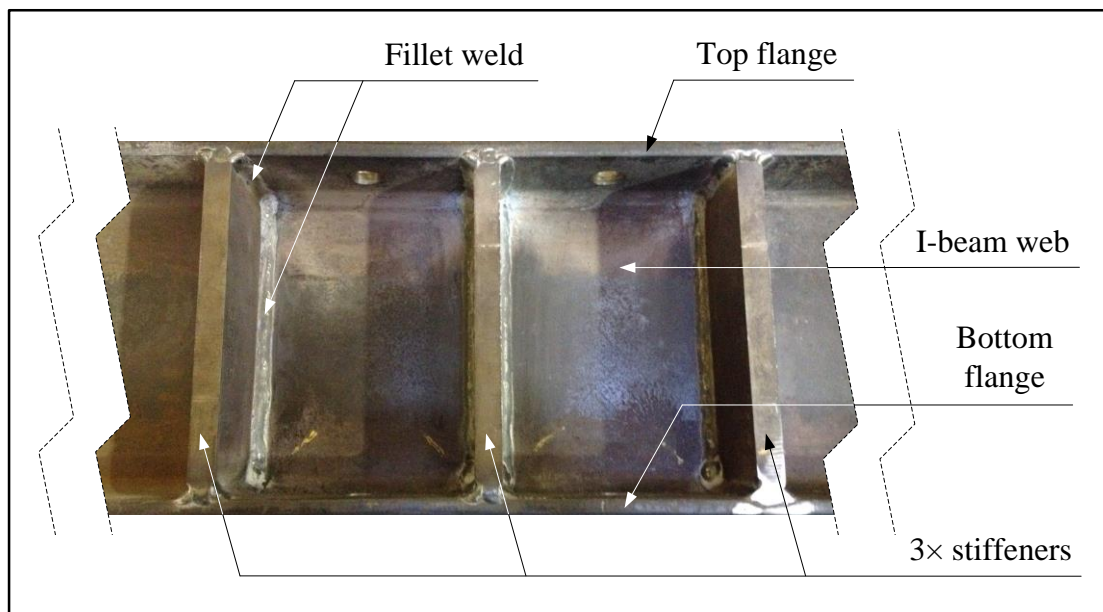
Details of the fillet welds in the beam assembly - dimensions in [mm]
